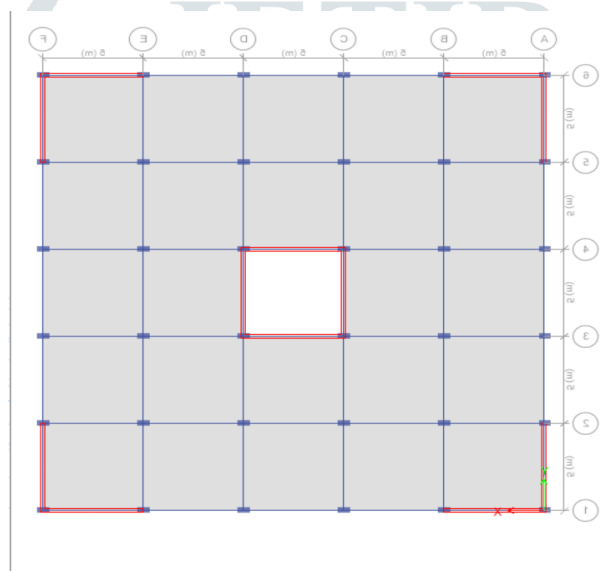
SYMMETRICAL BUILDING WITH GRP SHEAR WALL
